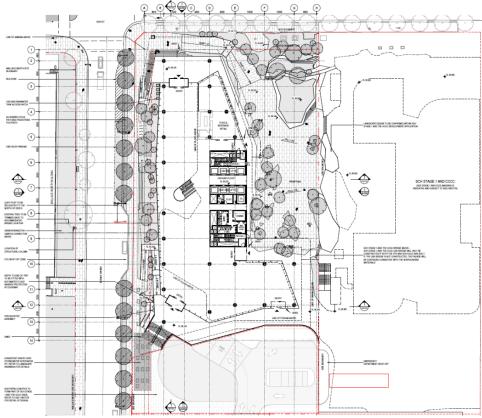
Proposed Ground Floor Plan. (Source: Architectus)
